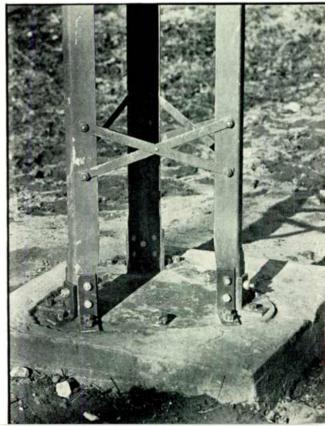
DETAILS AND DIMENSIONS OF THE CONCRETE BASE FOR THE TOWER
